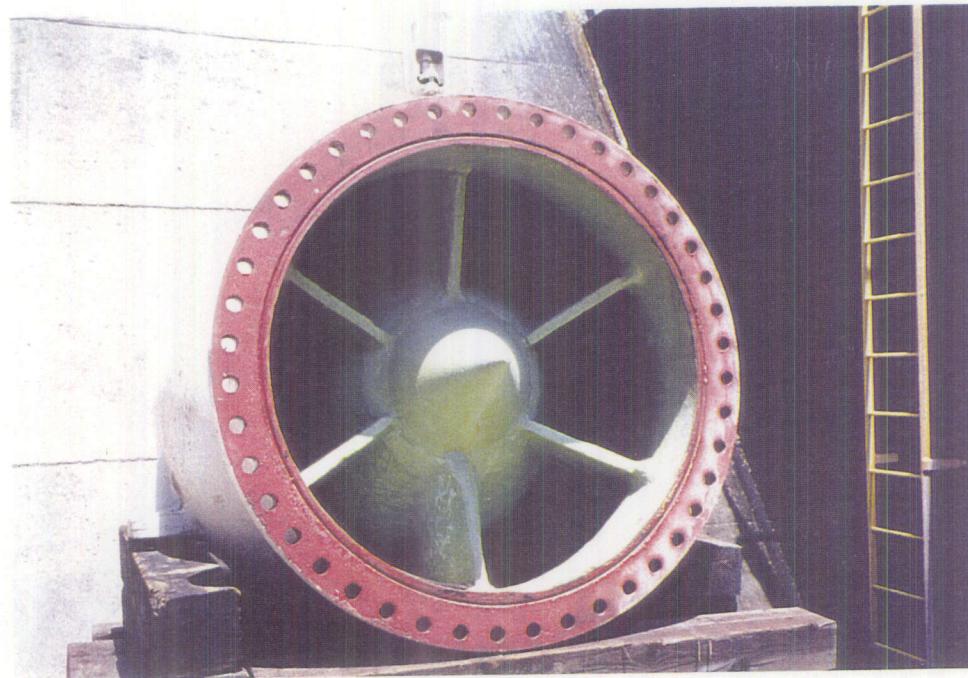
Morris Dam - Valve 5 (removed) - View showing removed
